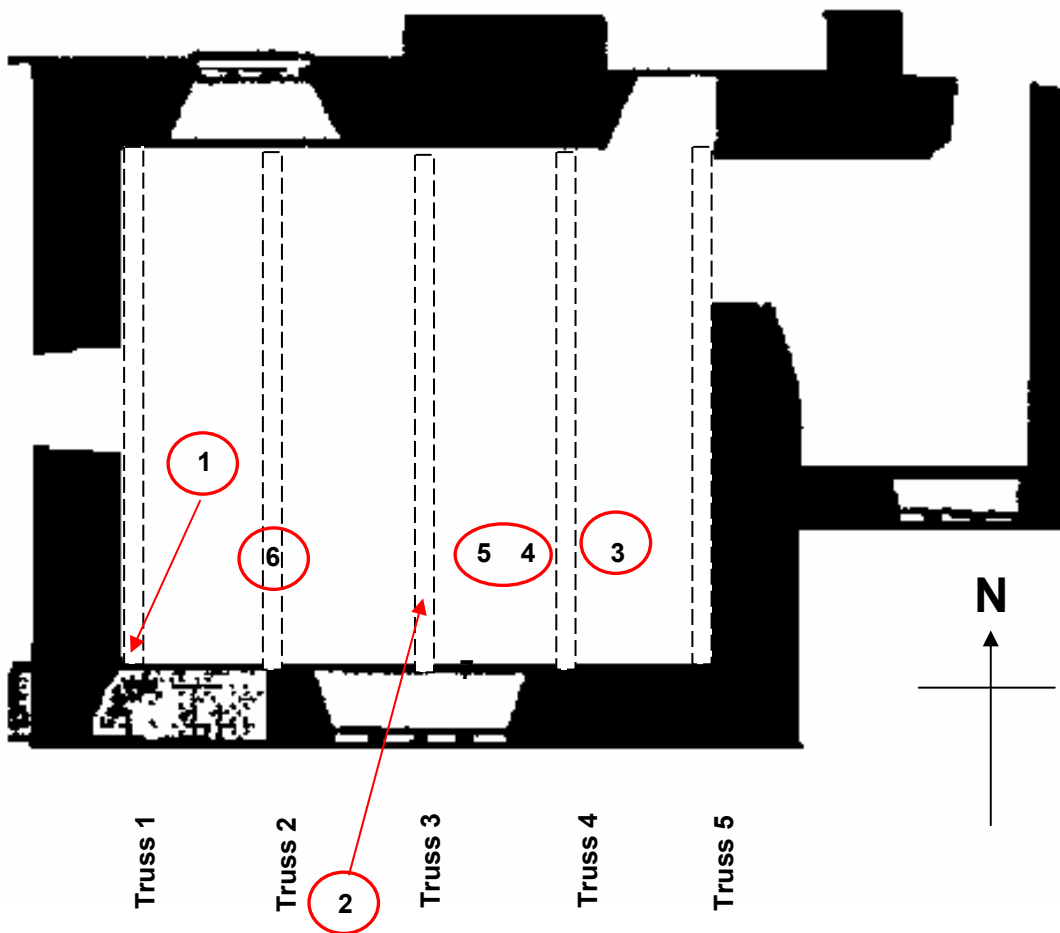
The former Hall range (now the farm house); plan to show approximate location of sampled timbers
